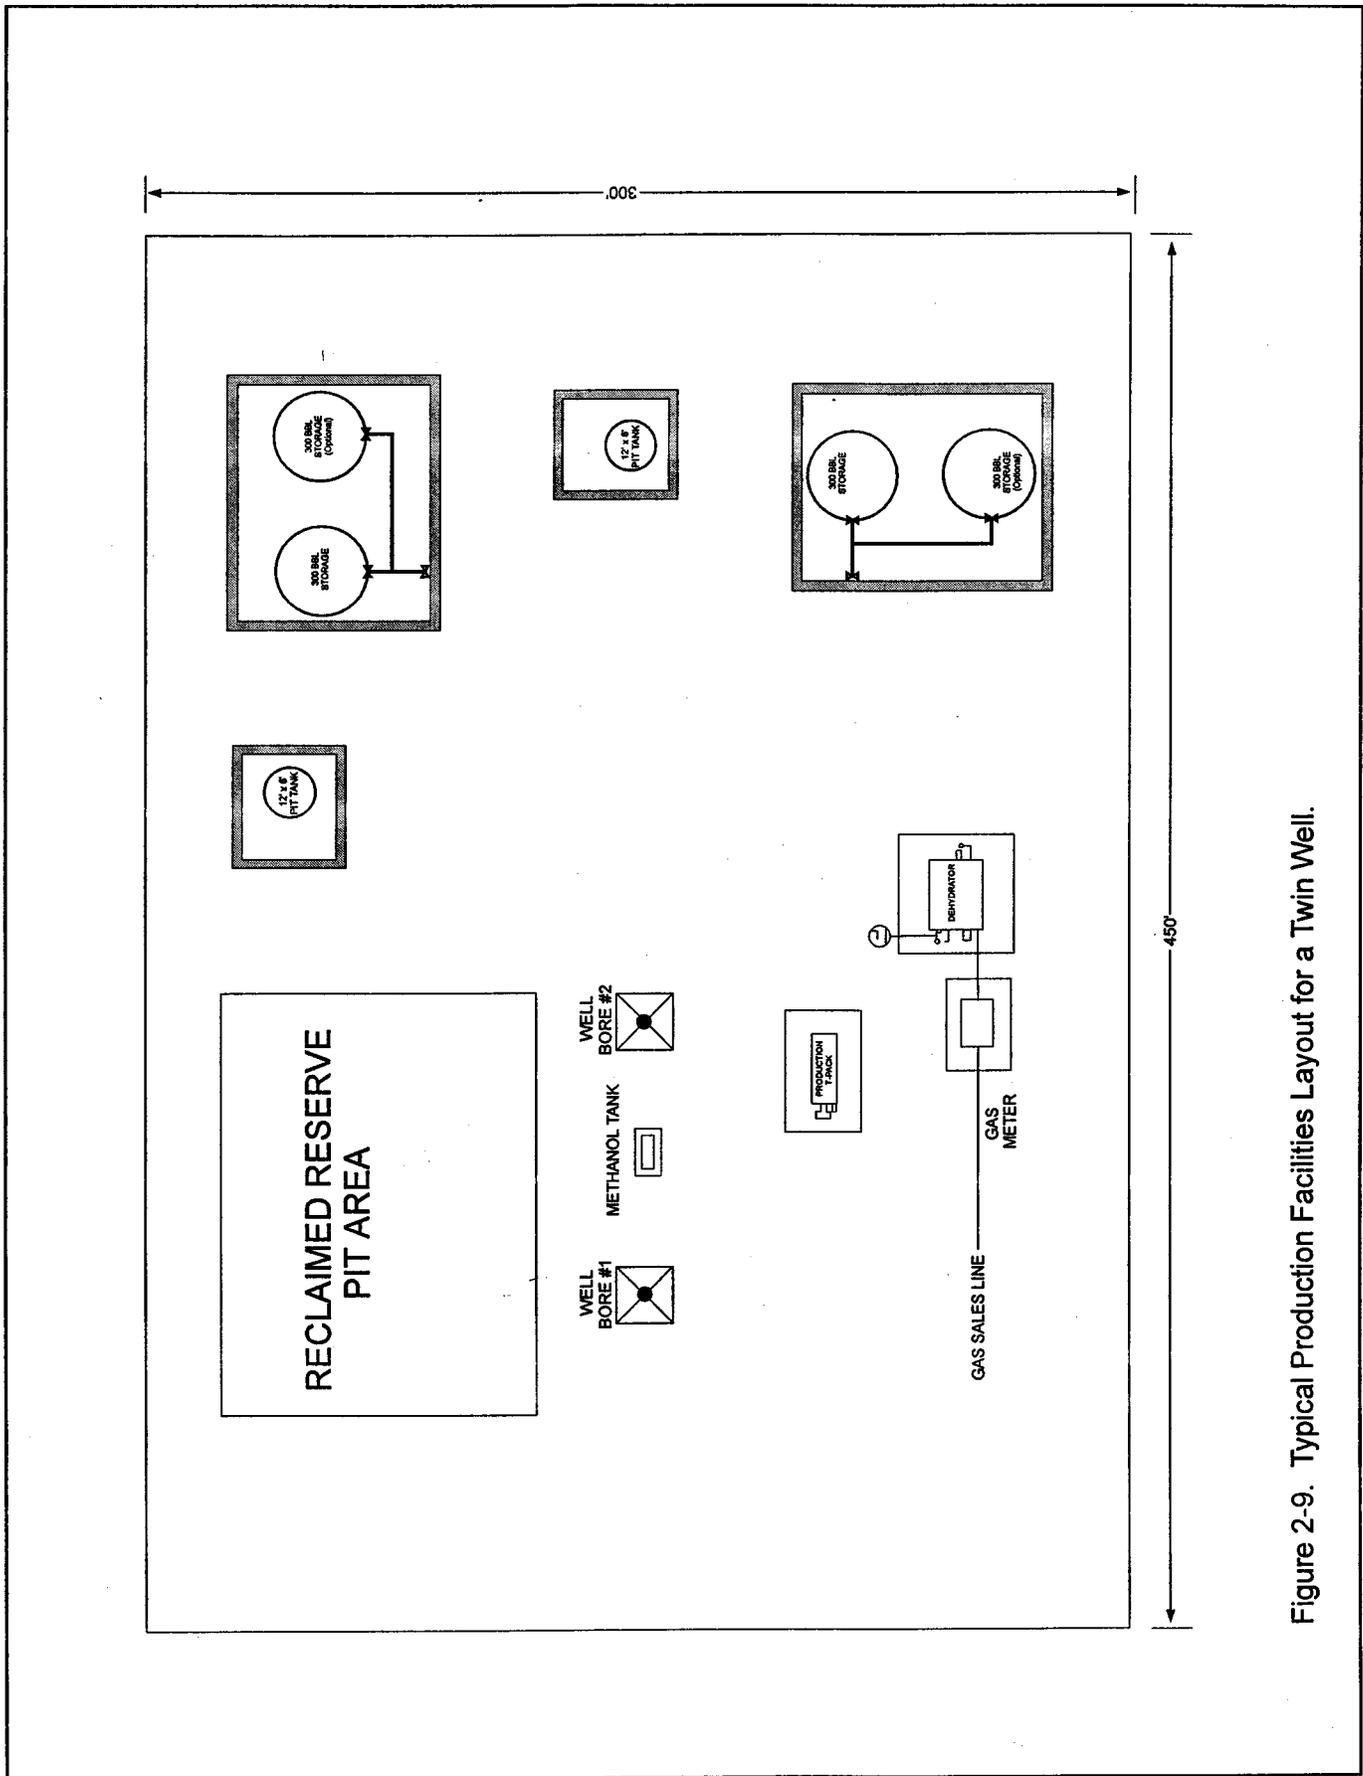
Typical Production Facilities Layout for a Twin Well.
